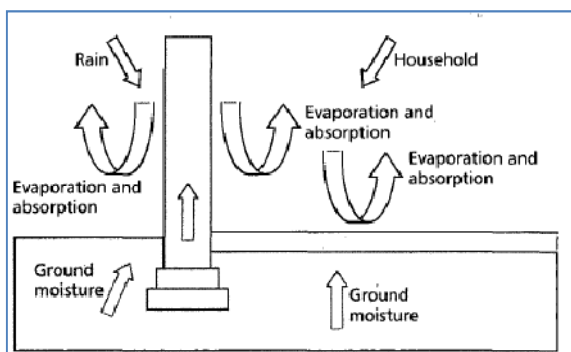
Moisture control in old buildings at wall to ground connection.¹⁴
